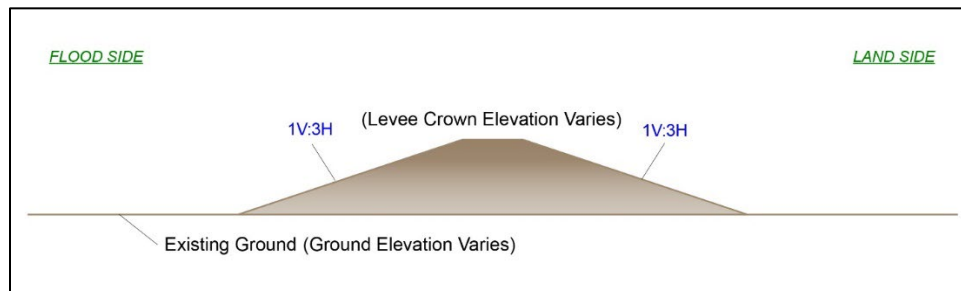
Typical Cross-section for South Slidell for Future Lifts
